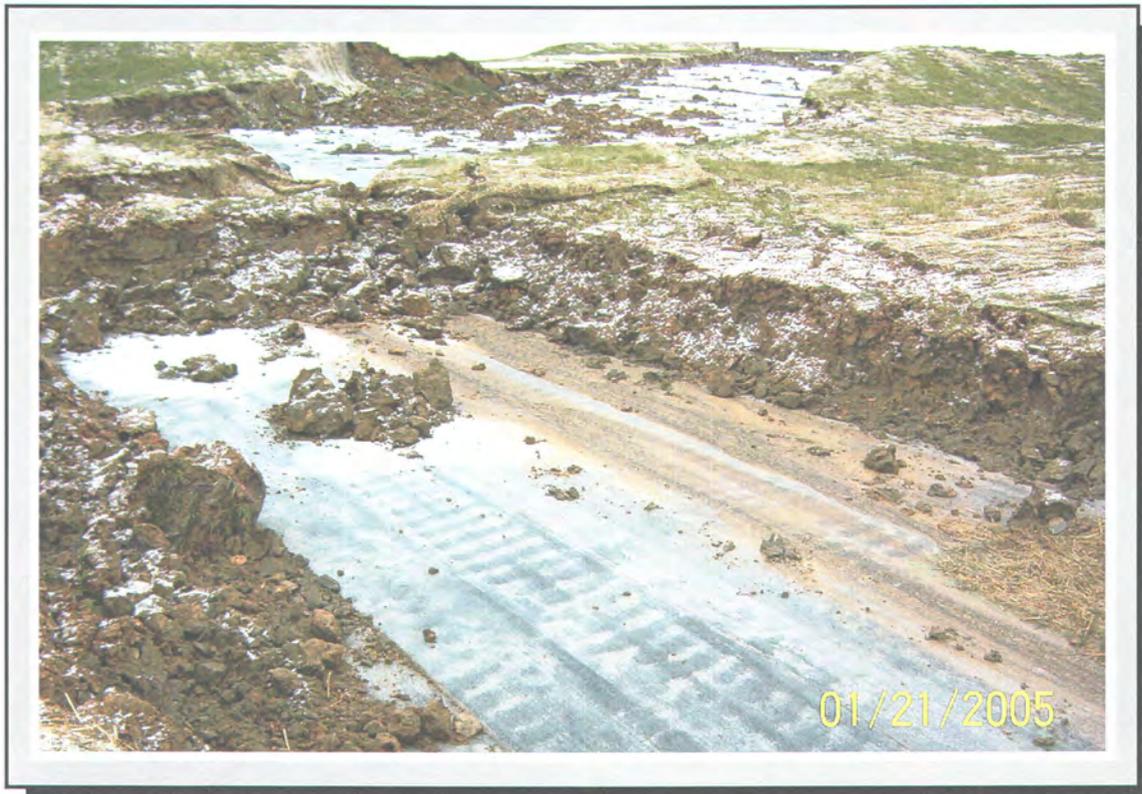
Area of cover system movement down slope of exposed geosynthetic clay liner area. Photograph taken from sideslope haul road looking east.
